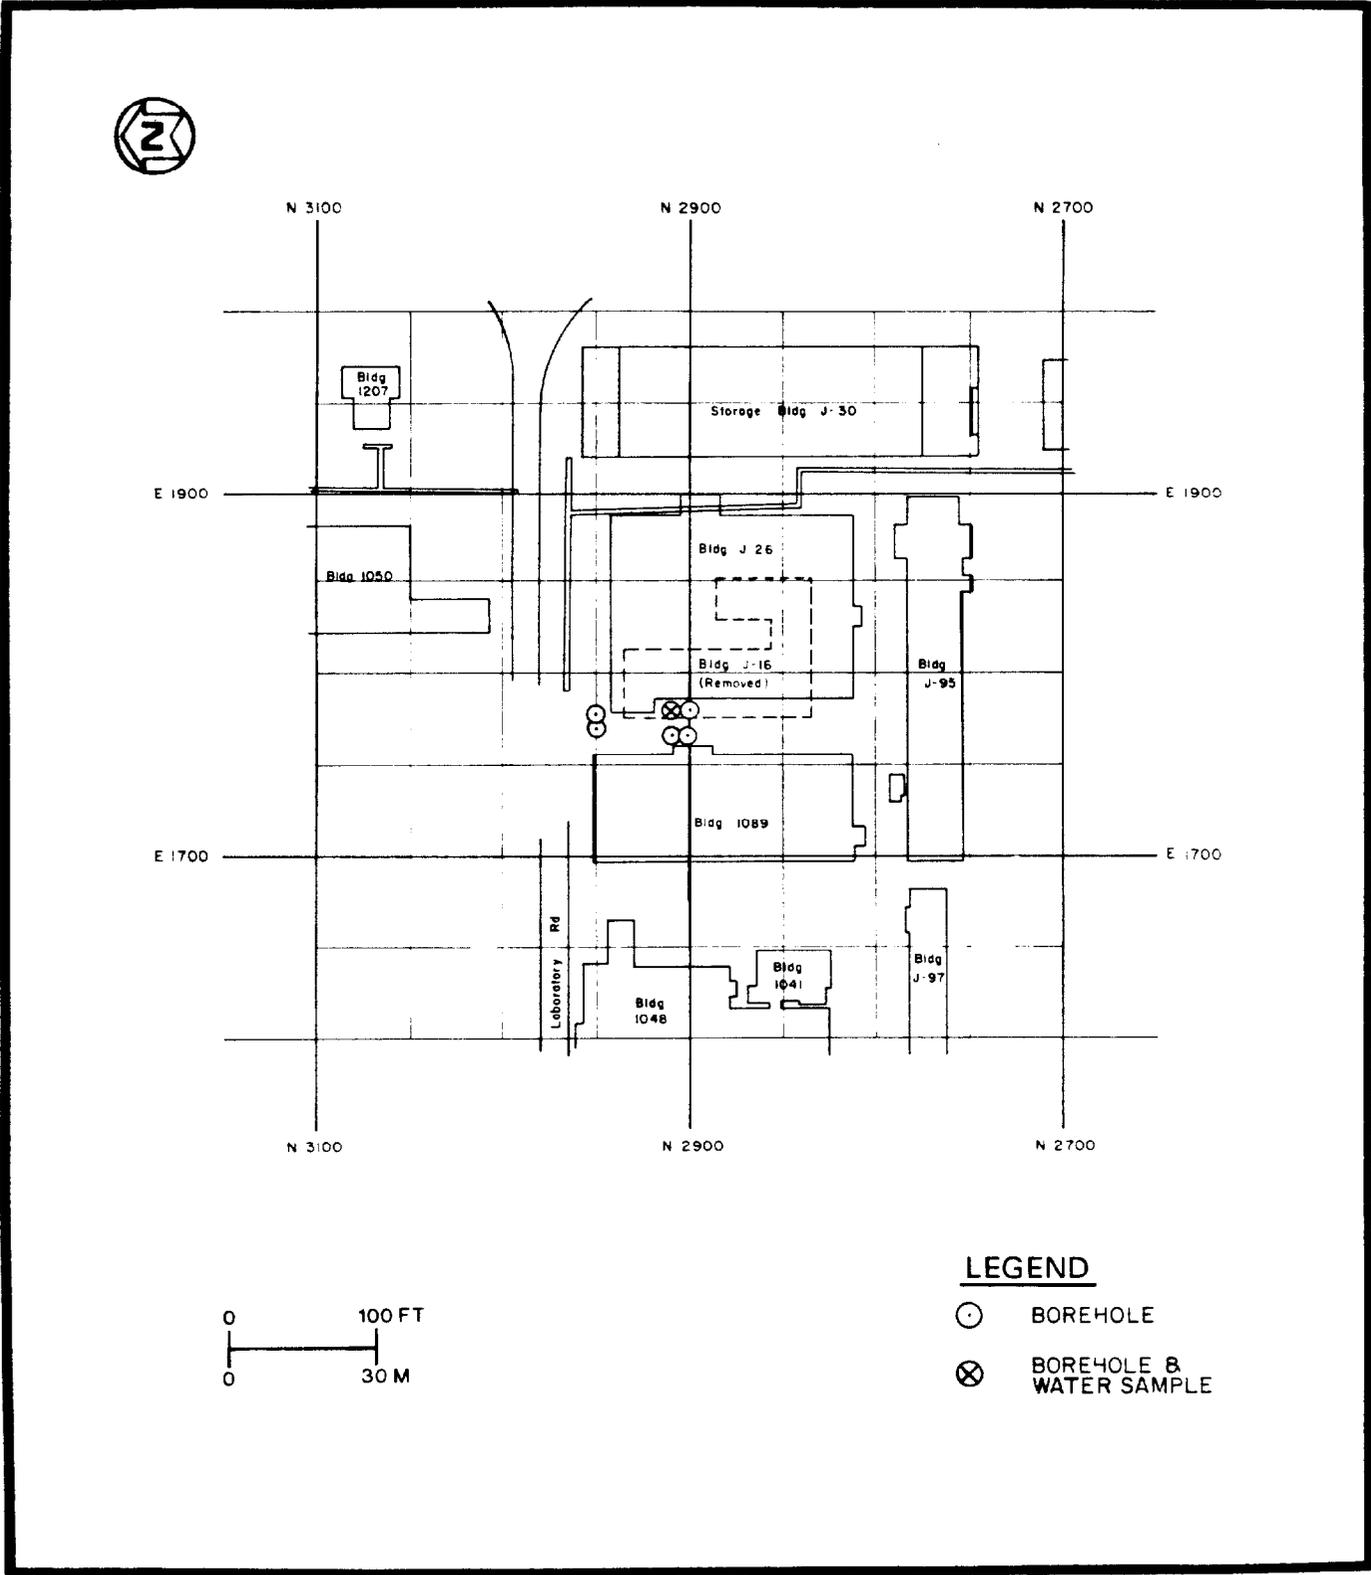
BOREHOLES AND WATER SAMPLING LOCATIONS, BUILDING J-26 AREA
